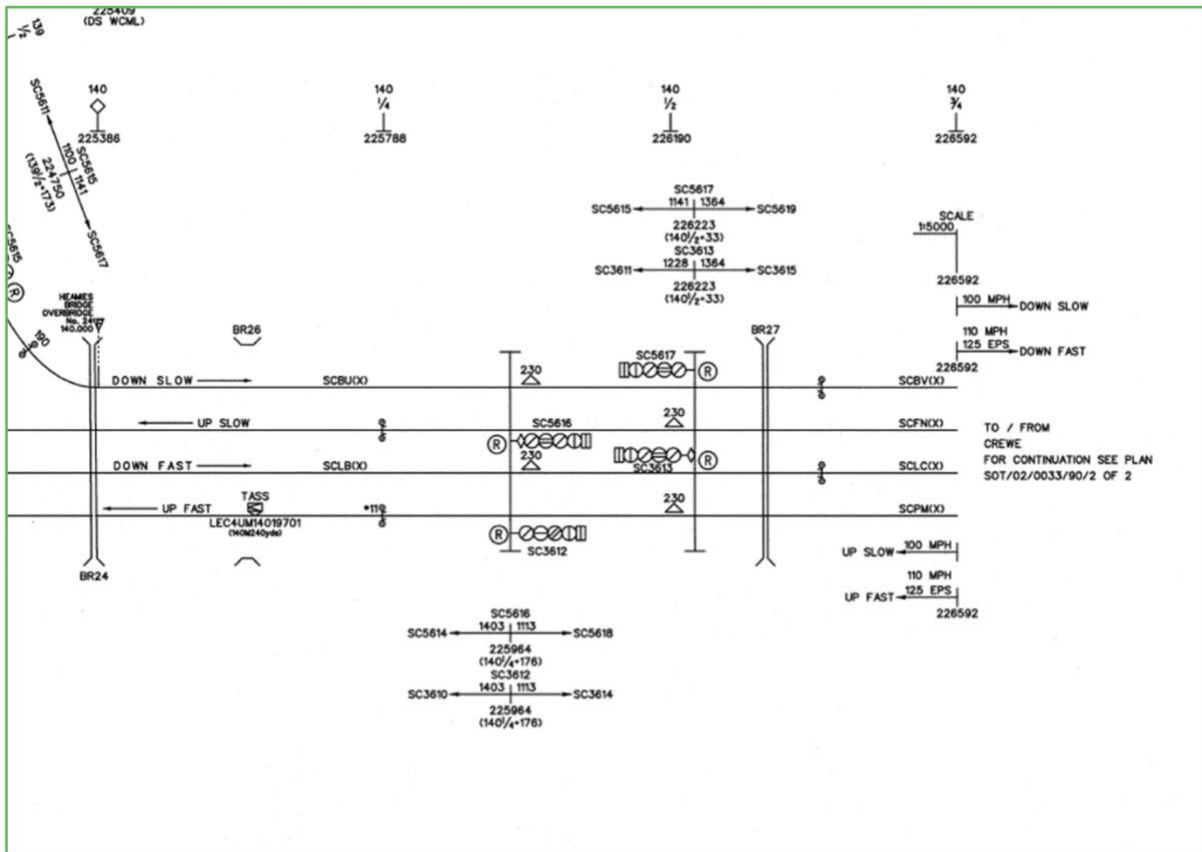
Extract from the local Signalling Plan. Full signalling plans attached as Appendix III
